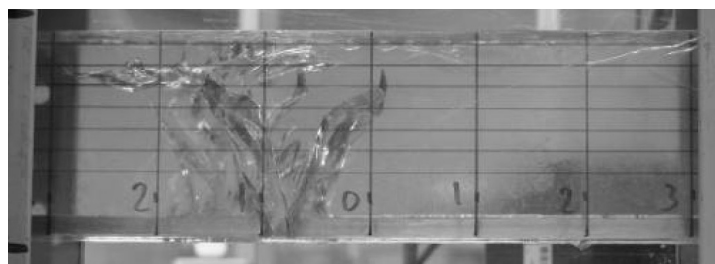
Typical fracture pattern in stocky beam after initial failure. The cracks run almost completely to the top of the beam.
